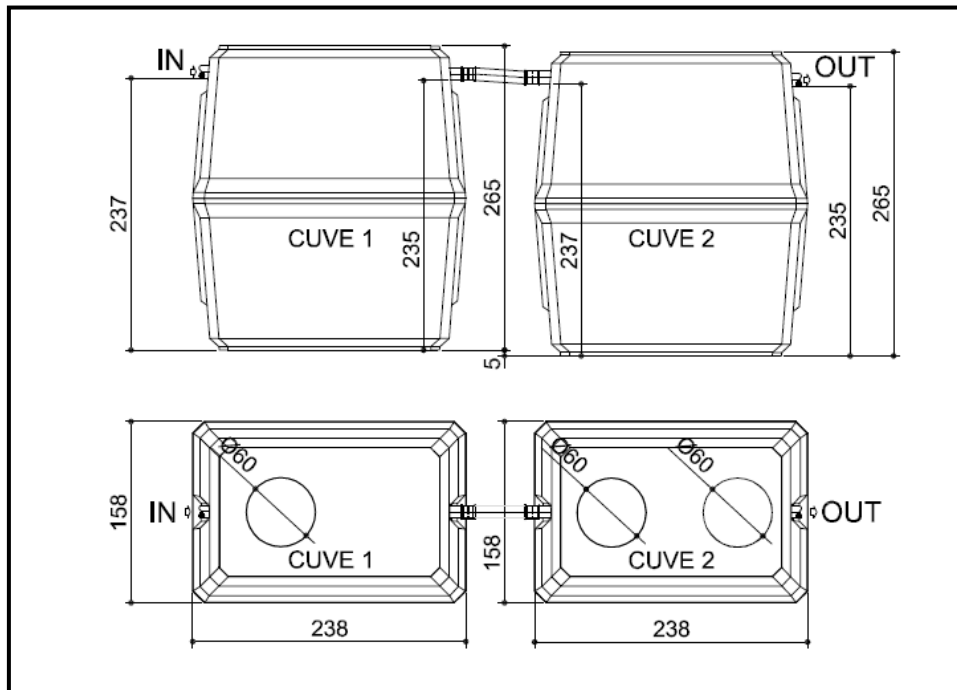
Dimensional drawing of the Oxyfix® C-90 MB 20 EP (2)
